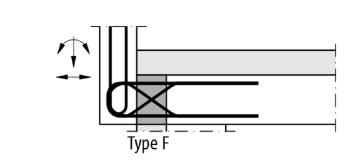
Schöck Isokorb[®] Type F for facing parapets
